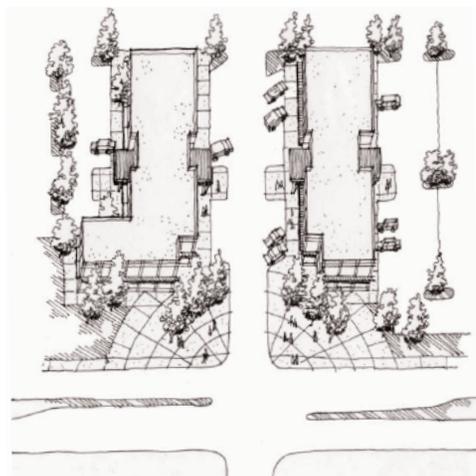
Retail buildings create a facing commercial frontage and provide visual access from the adjacent neighborhood.
